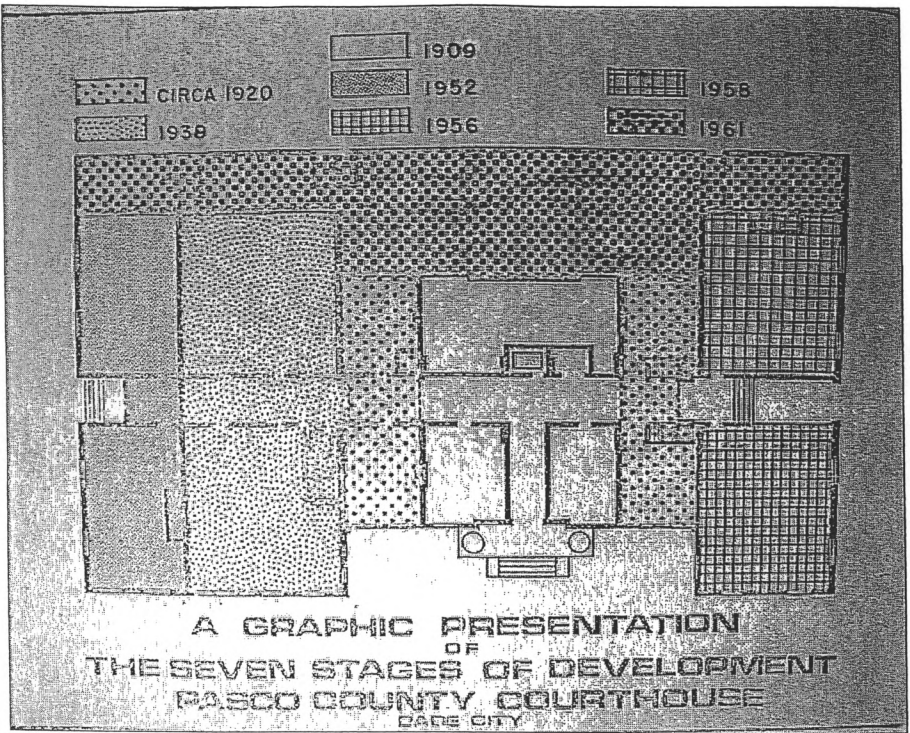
Pasco County Courthouse, floor plan diagram of additions to the building.
